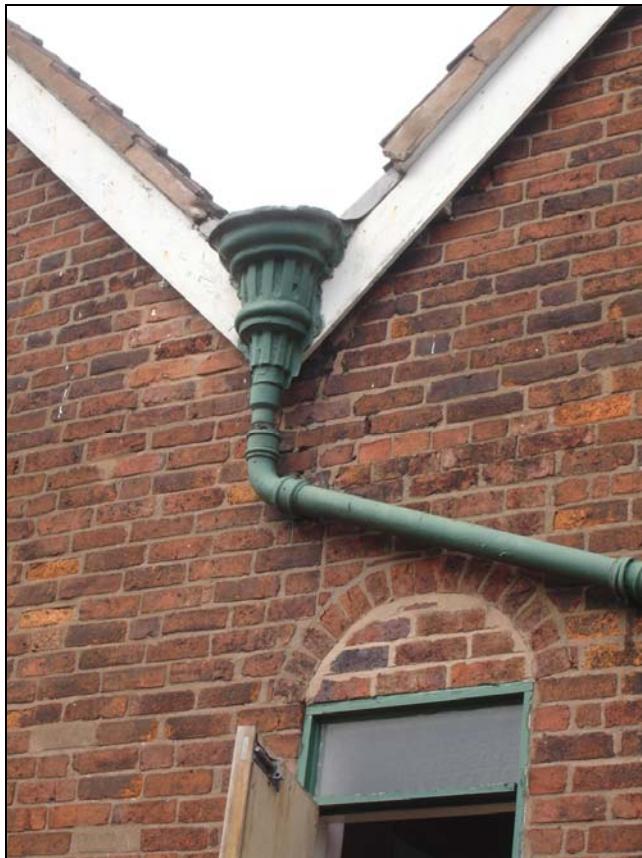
Cast iron drainage hopper at the rear of No. 60 Tower St, looking N.
